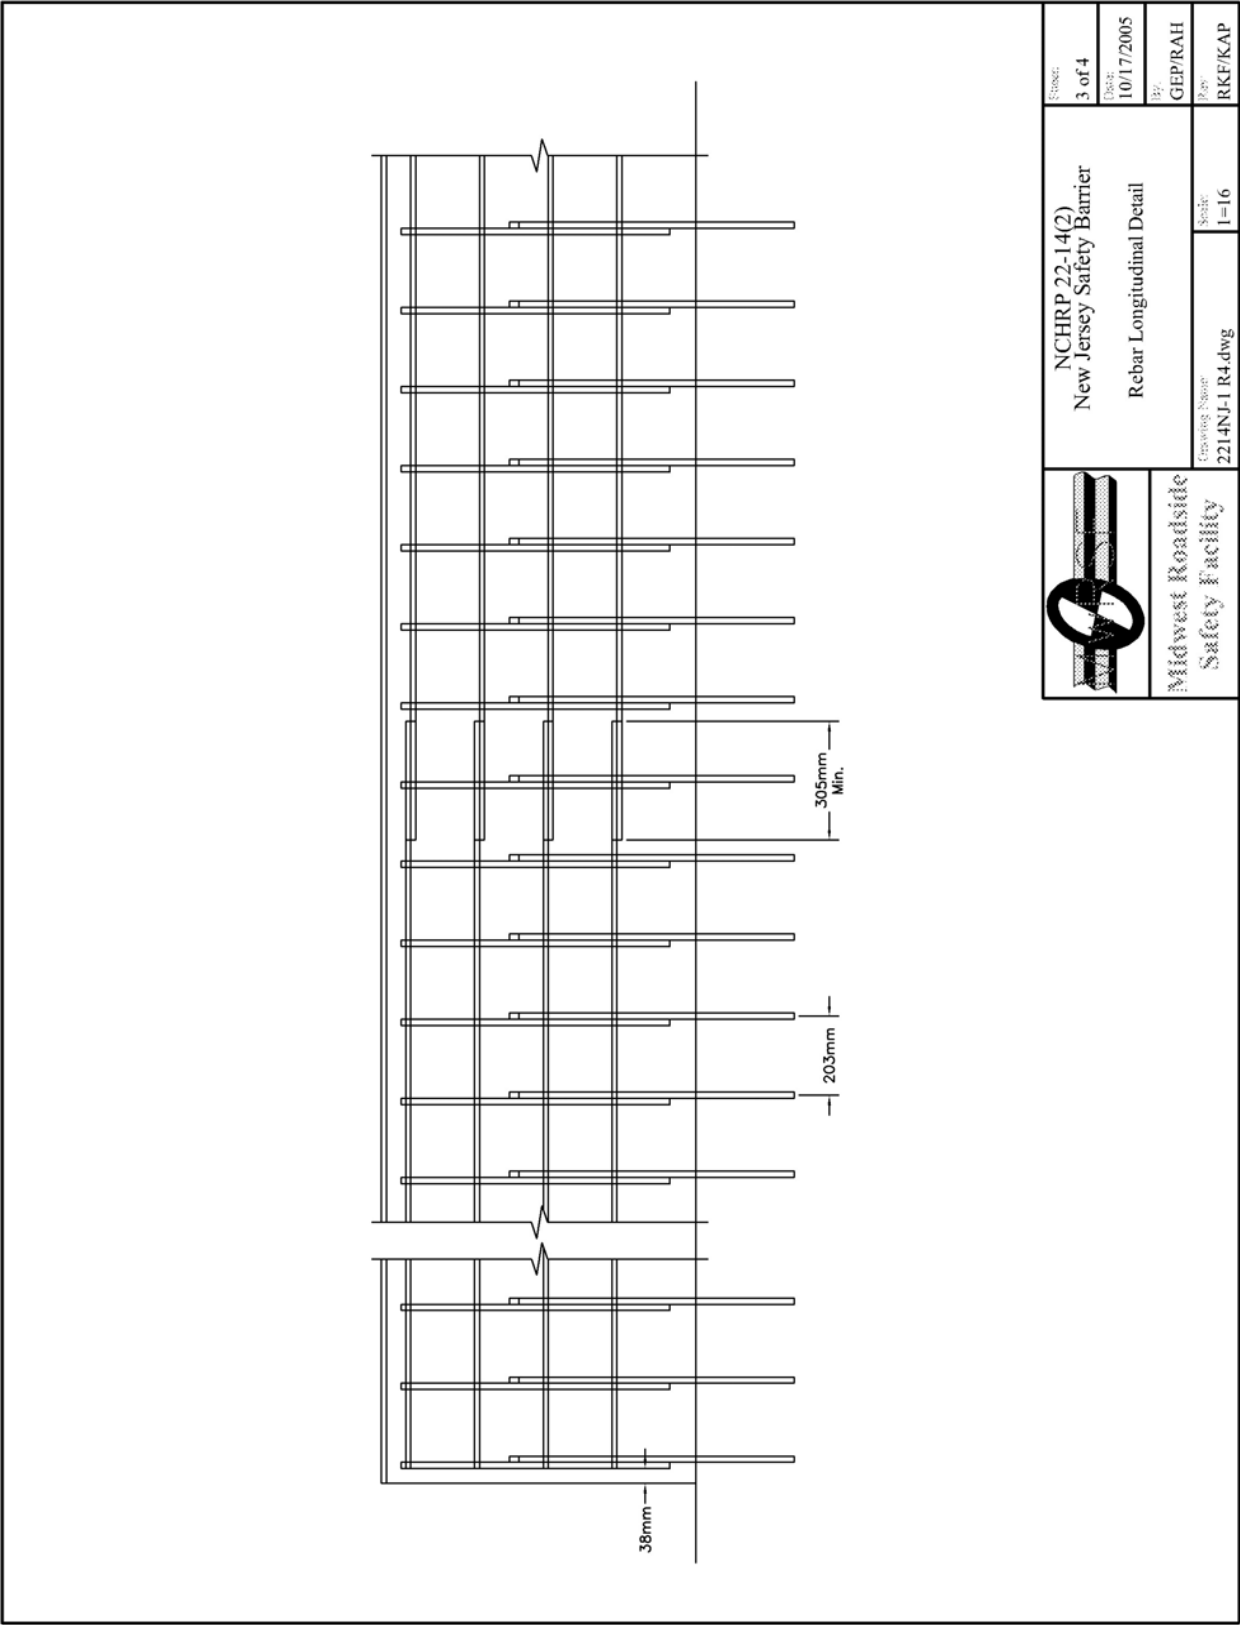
Permanent New Jersey Safety Shape Barrier Reinforcement Layout Details
